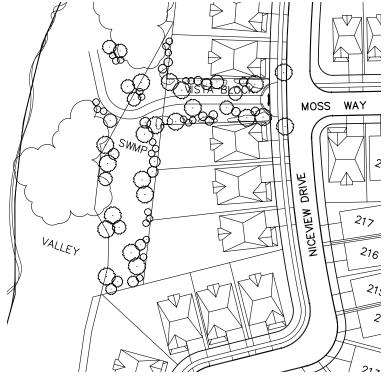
Vista Block / SWMF / Valley Demonstration Plan
